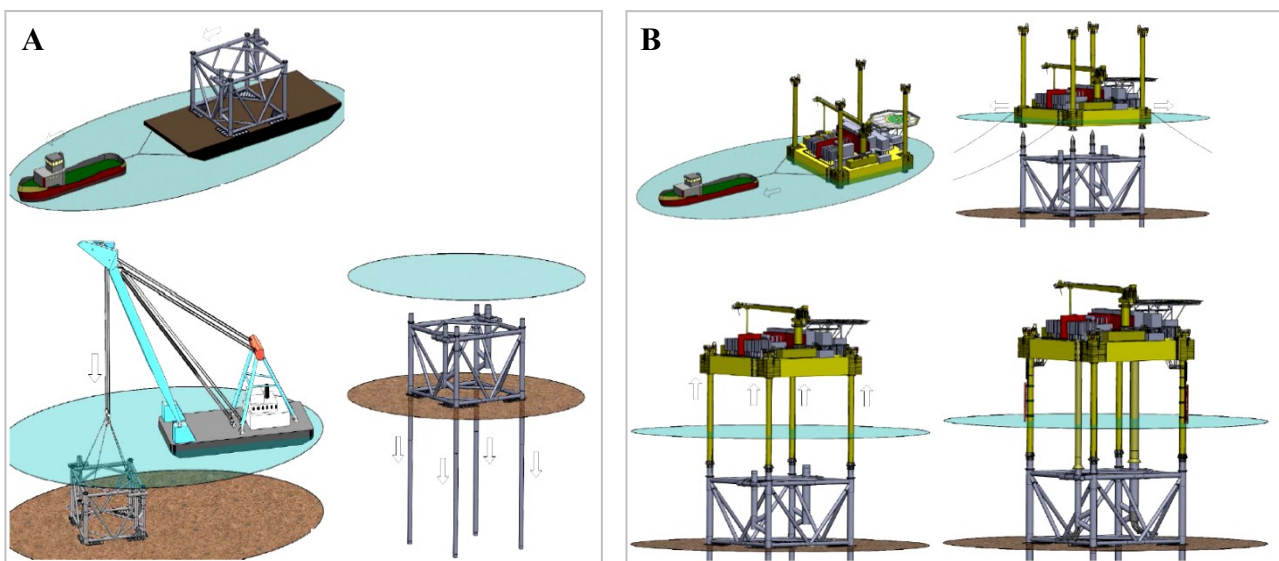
Substation installations of the substructure (A) and the platform (B)
